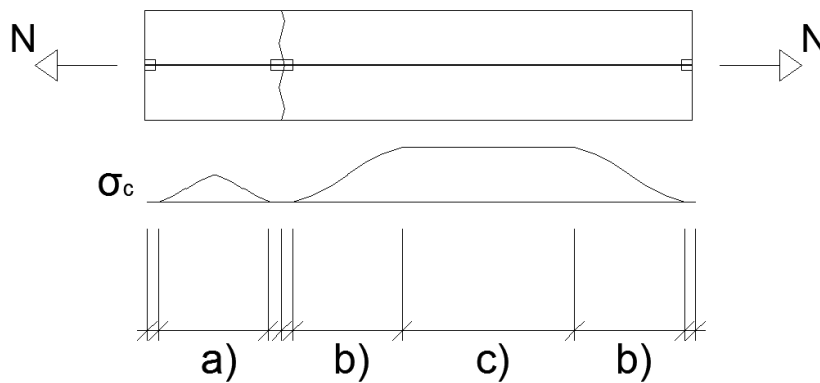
Cracking process for a reinforced concrete element
